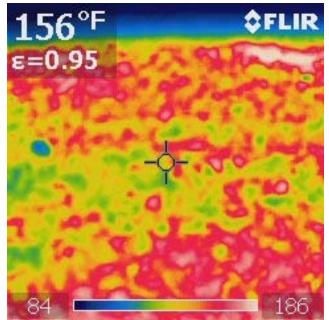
After Mill Pass 3, IH410Fr, Patch 2/16-1.
